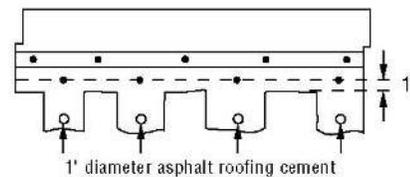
Fastening Presidential and Presidential T/L Shake shingles on steep slopes.
